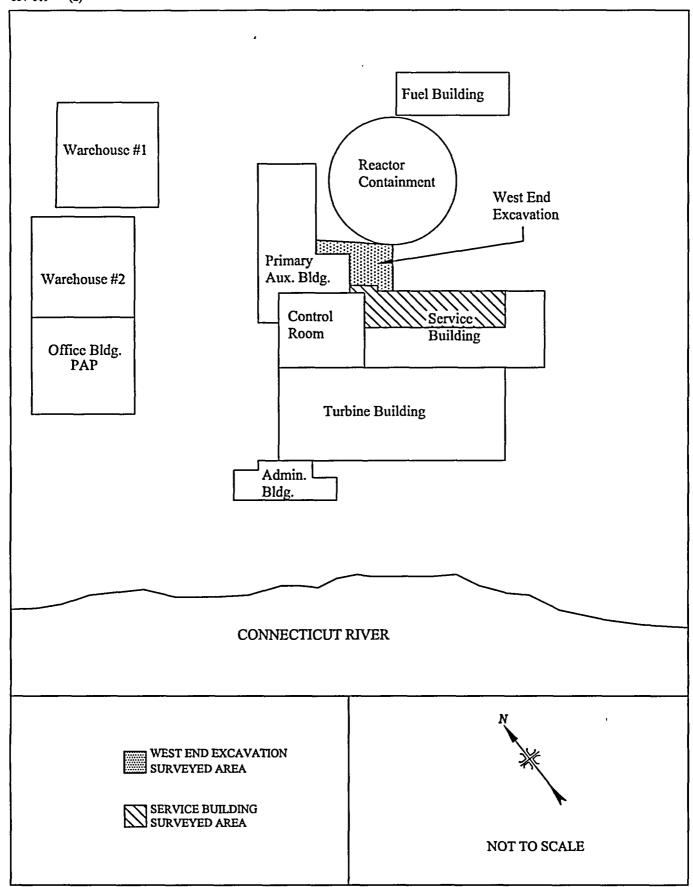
Plot Plan of Buildings at the Connecticut Yankee Haddam Neck Plant Indicating Surveyed Areas
